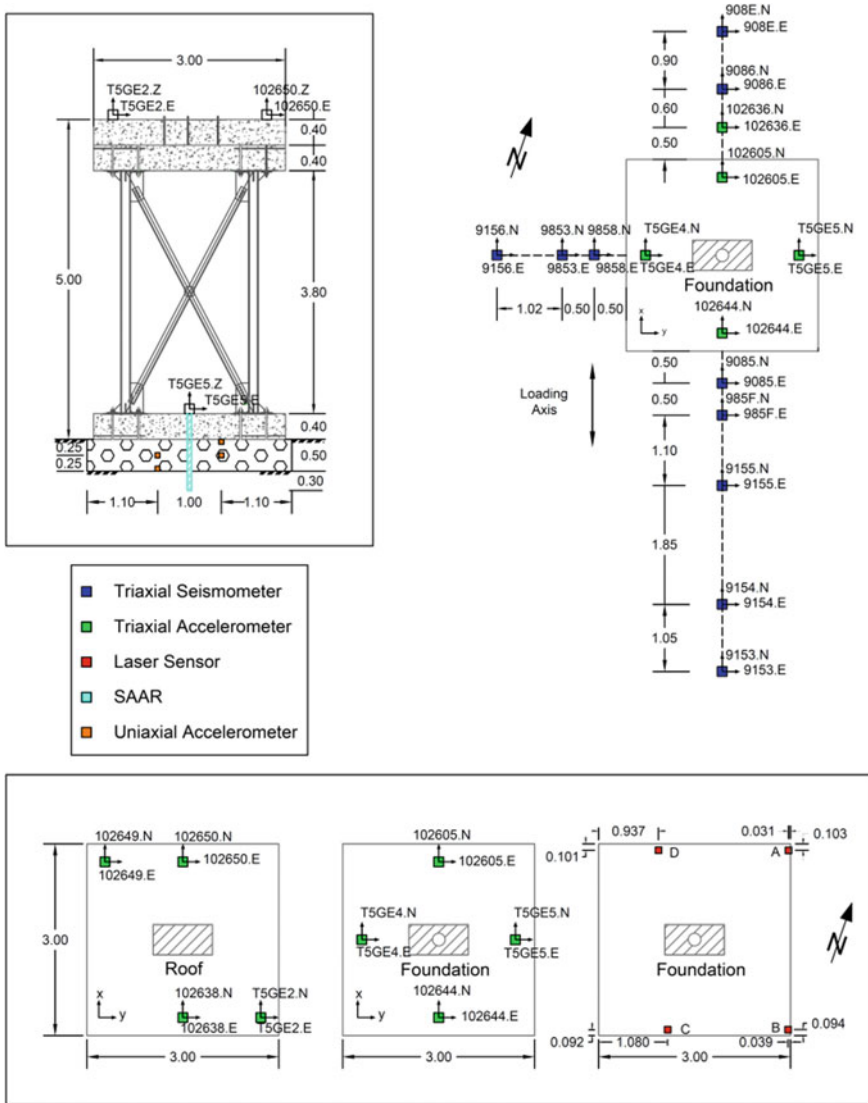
Cross section of the foundation soil and structure instrumentation (top left), plan view of the foundation and soil surface instrumentation (top right), and plan view of the roof slab instrumentation (bottom left), the foundation slab instrumented with the accelerometers (bottom center) and with the laser sensors (bottom right)
